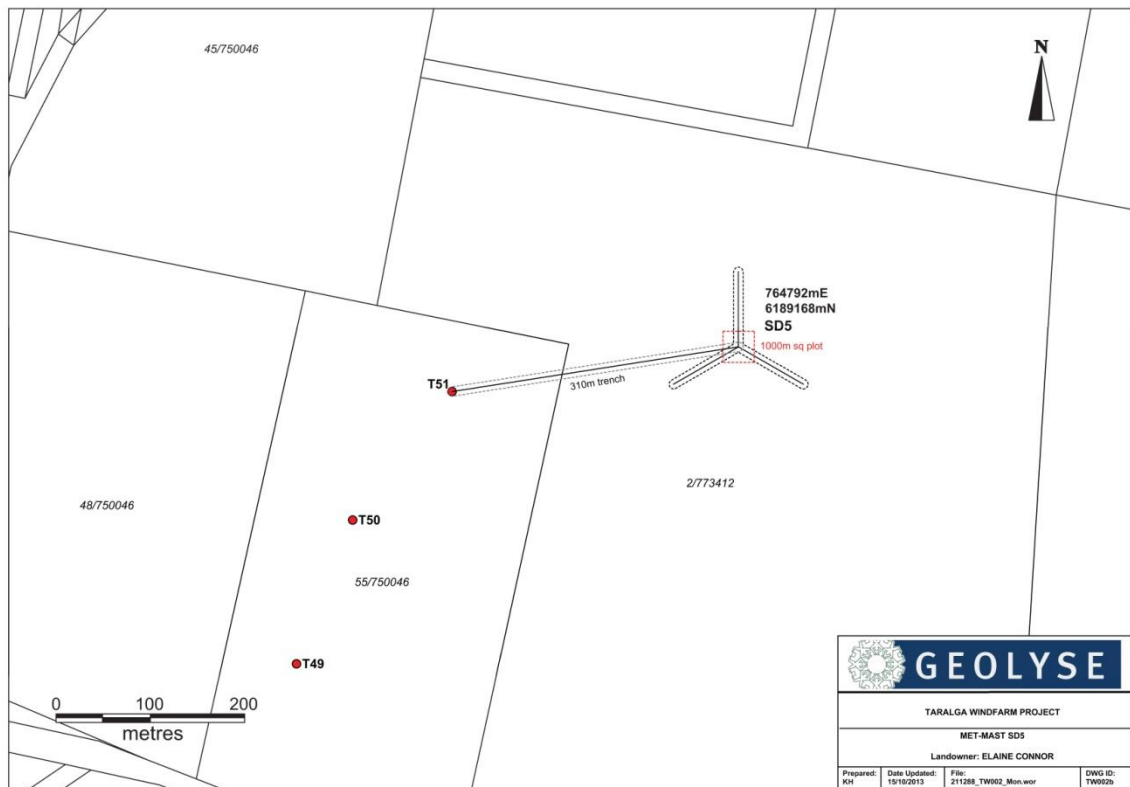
Plan of the proposed works at met-mast #SD5 and proposed trench to Turbine 51.
